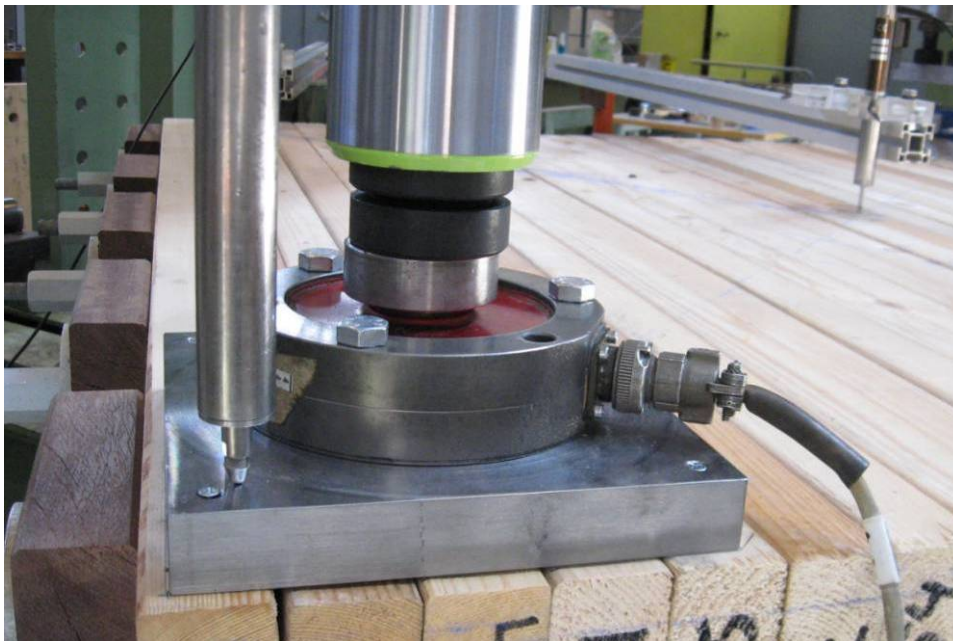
Detail of loaded corner with LVDT, HBM W50TS on the steel plate close to the hydraulic jack that applied the load.
